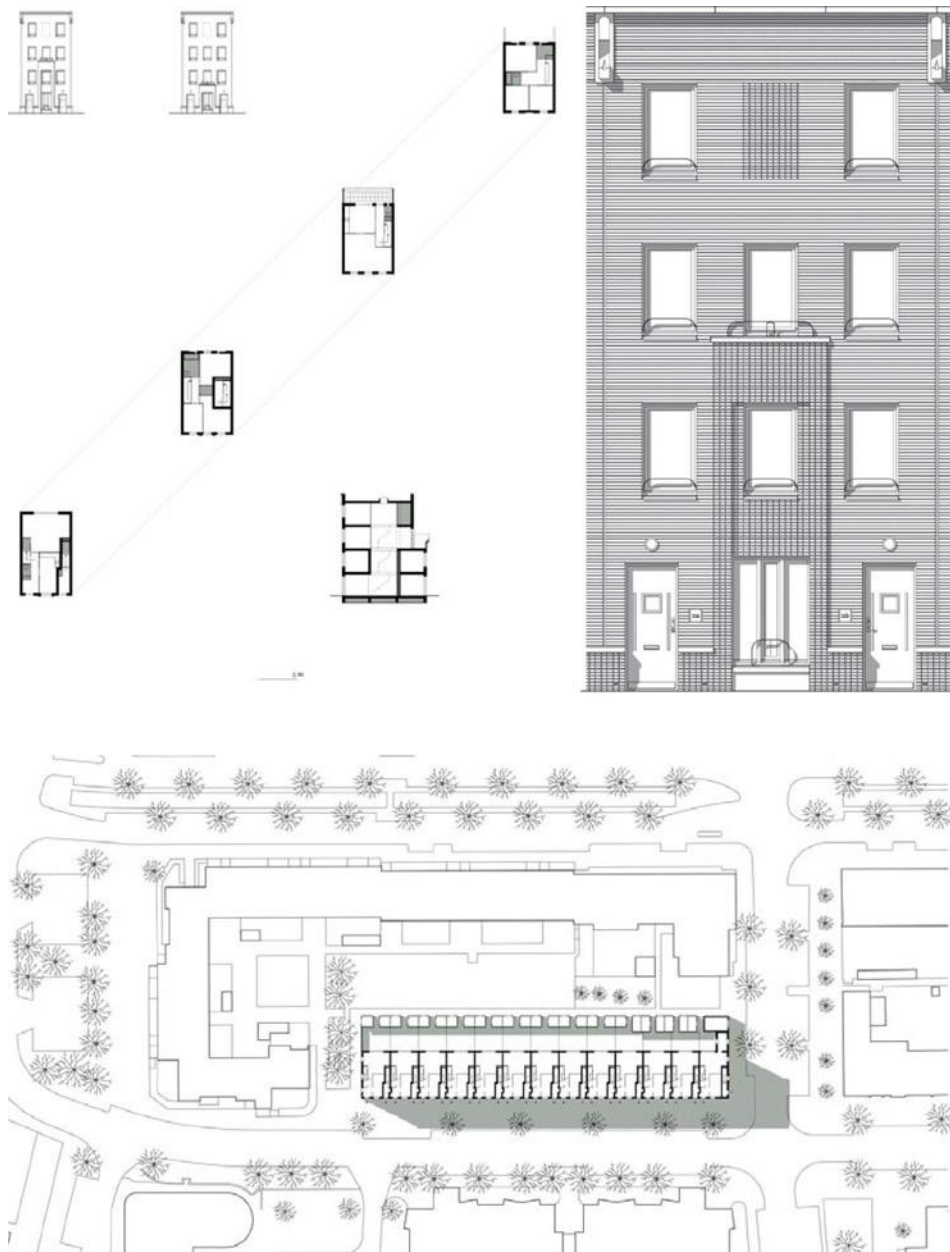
Hans van der Heijden, Two-door houses, social housing buildings realized in Rotterdam, Feijenoord district (2017-2020), plans and elevation.
